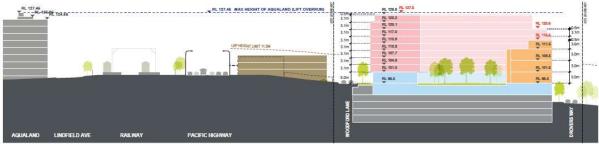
Proposed elevations showing how the site will be consistent with the Council resolution to have no building higher than the RL's of the Aqualand building east of the Pacific Highway (Urban Design Report)
